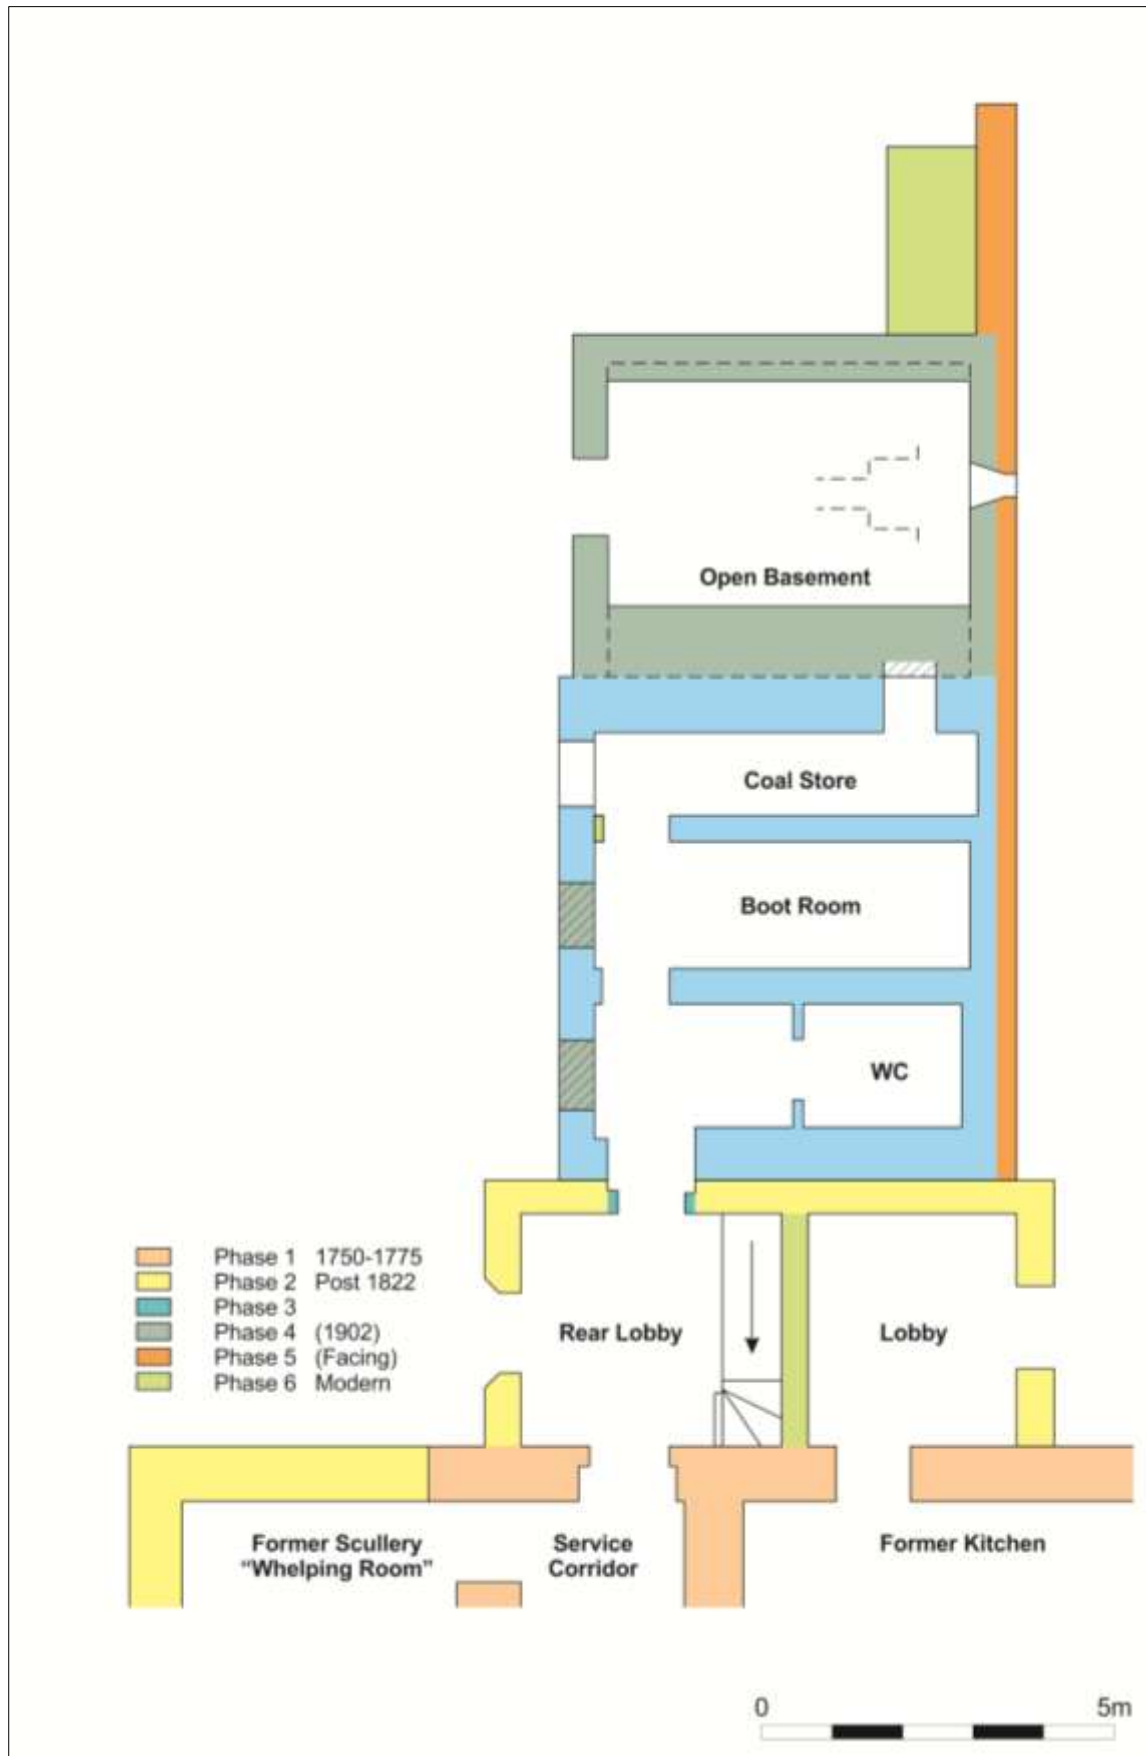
The kitchen block ground floor/basements (1:100 scale at A4)
